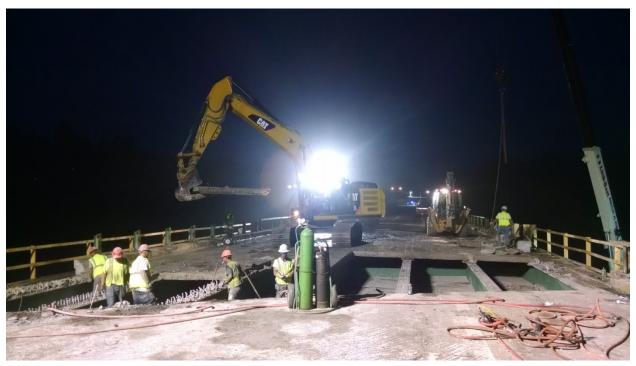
Slab removal with haunch concrete demolition and shear connector removal in progress.
